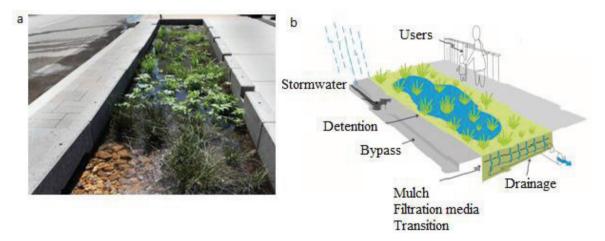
(a) Rainwatergarden; (b) Critical elements in rainwatergarden design [14].
